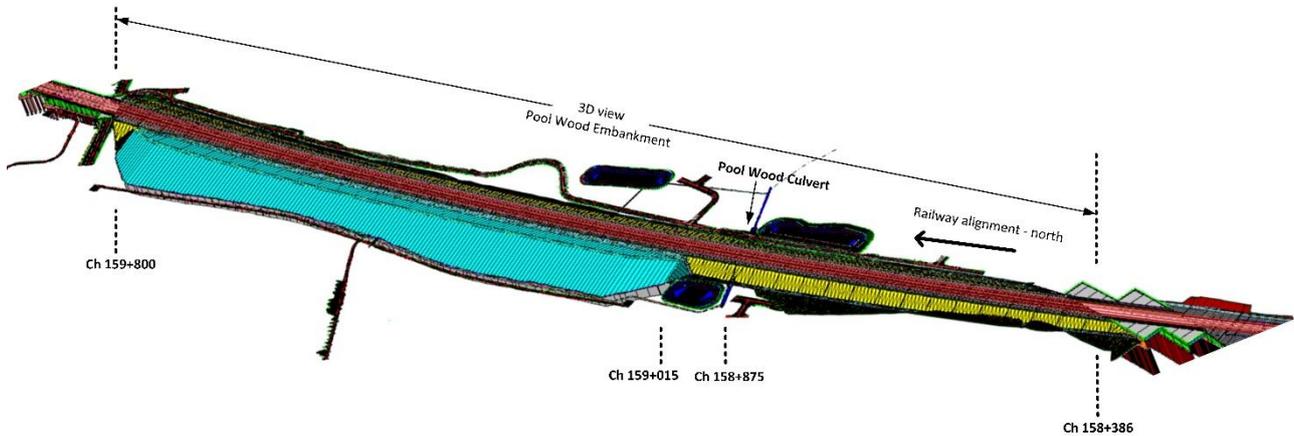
Location of Pool Wood Embankment & Pool Wood Culvert
